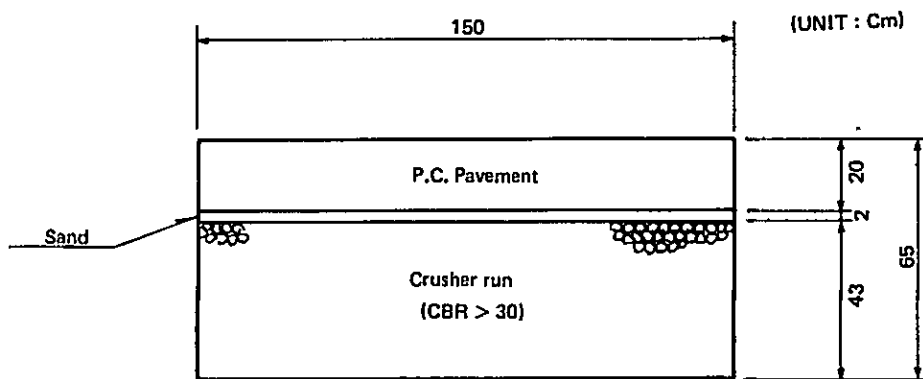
P.C. Pavement for the Course of Transfer Crane
